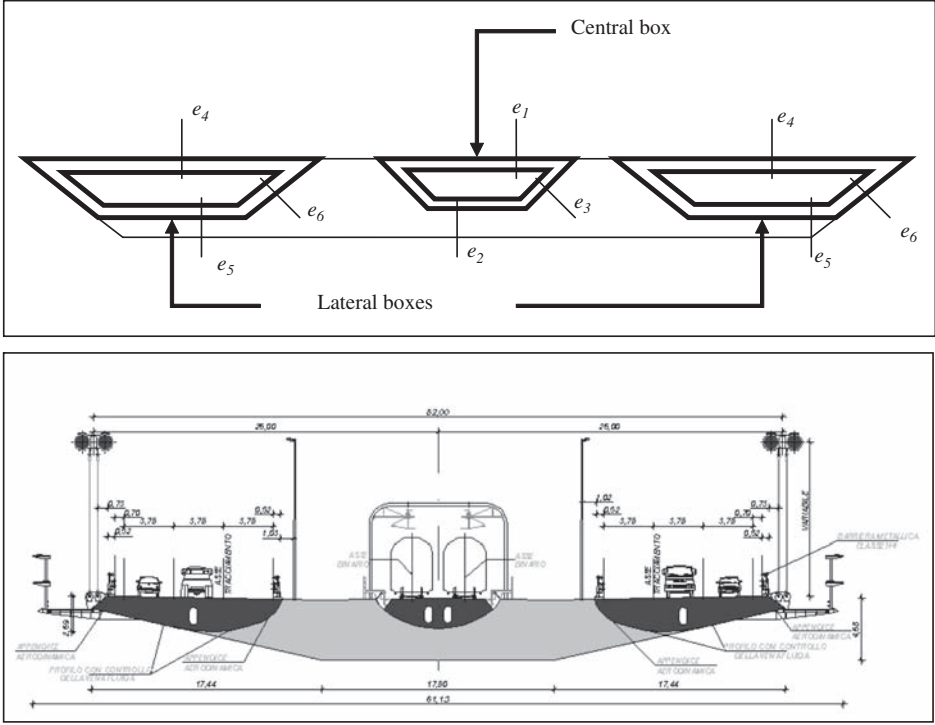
Messina Bridge simplified deck cross section and real deck cross section.
